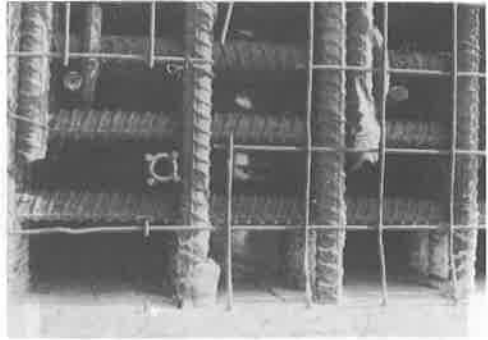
Detail of Wall Reinforcing at Outside Face: three layers each way. Main bars are all 35M. Horizontal and vertical post-tensioning tendons are at the middle of the wall. Wire mesh and through wall ties are also shown.
